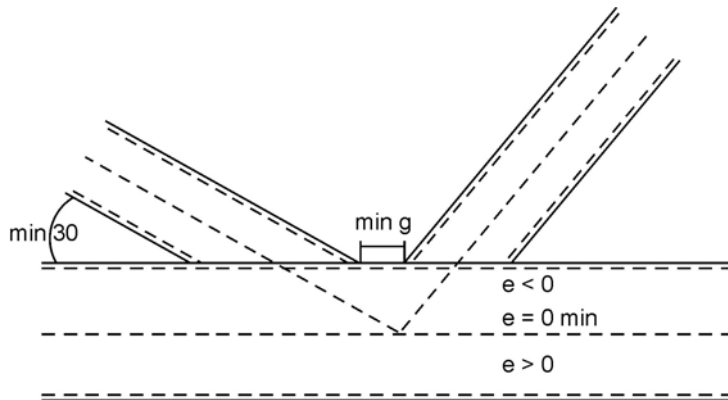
A typical K joint between structural hollow sections (Yrjölä 2008).
